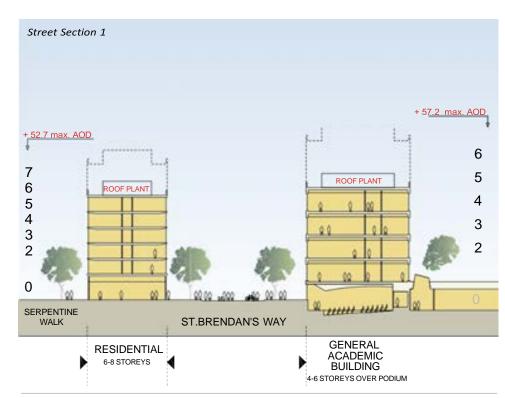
Section 1 illustrates a section along St Brendan's Way, through a 6-8 storey building, (if in residential use), or a 6 storey building maximum (if non-residential use), and a general academic building of 4-6 storeys over podium. The buildings will be a maximum of 52.7 and 57.2 metres above ordnance datum (A.O.D.), including any rooftop plant.
